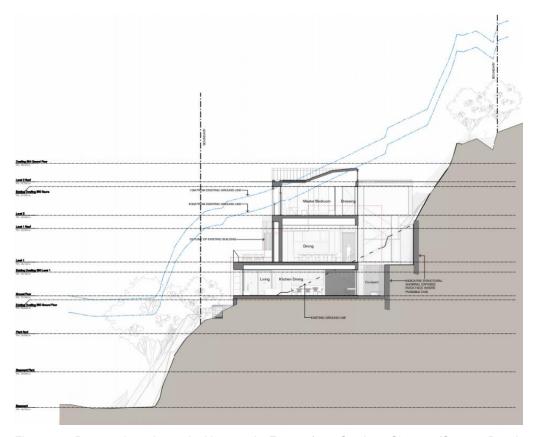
Proposed section 4, looking south, Extract from Sections Sheet 4 (Source: Drawing No. 3003, Rev. A)
